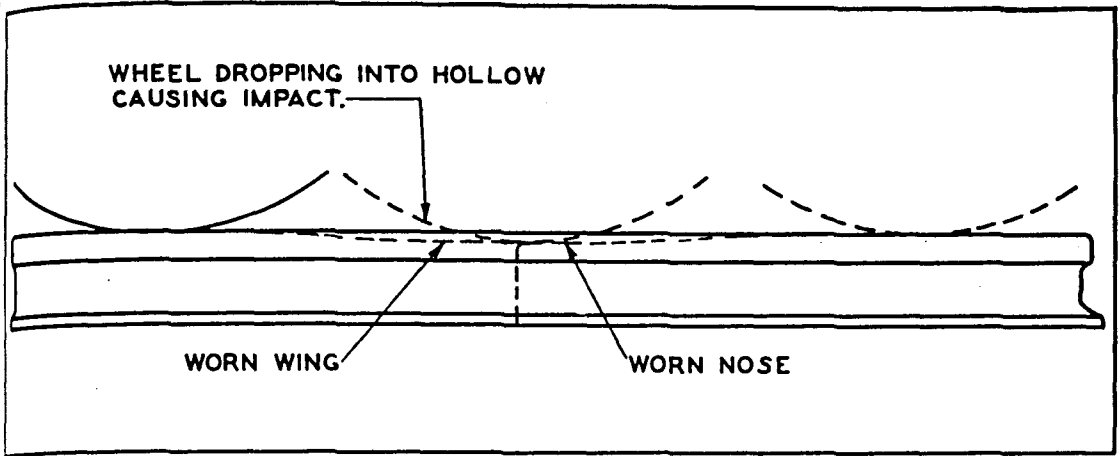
WHEEL IMPACT ON WORN CROSSING.
